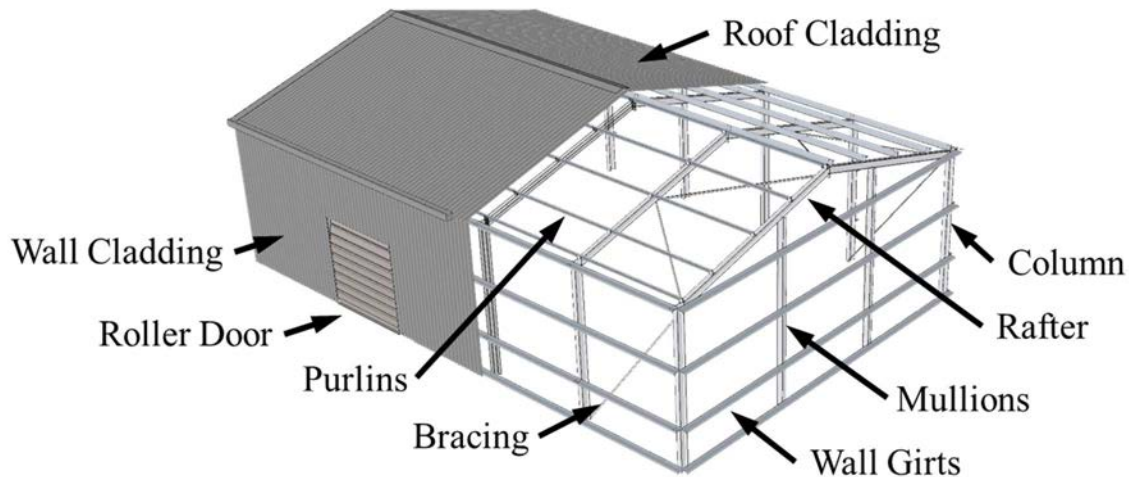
Schematic of a Steel-Clad, Portal-Frame, Industrial Building
